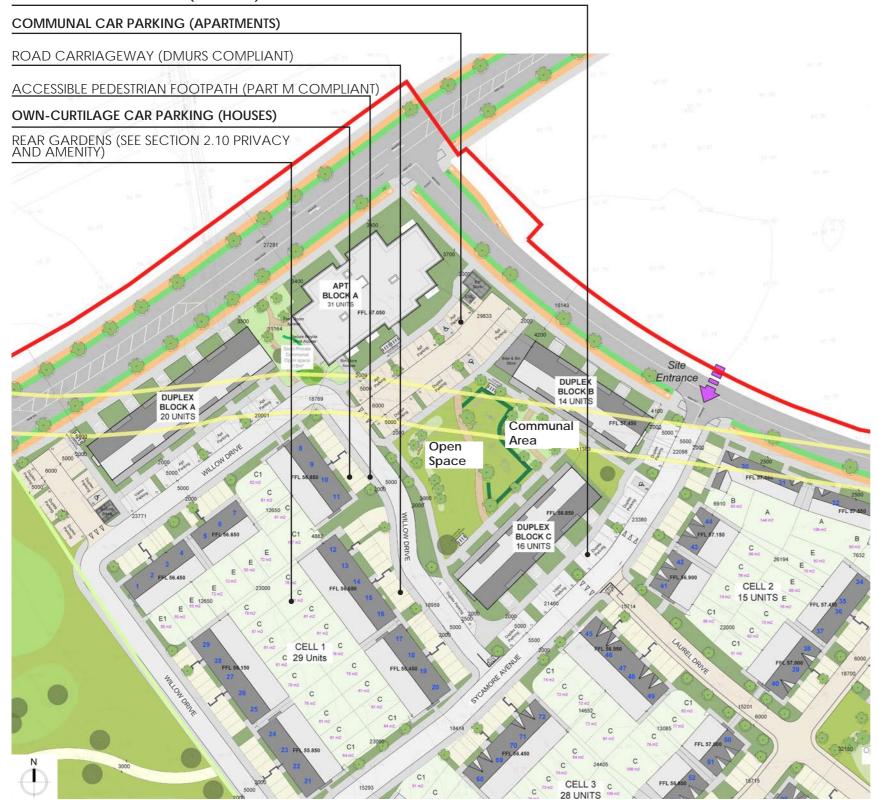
Detail of parking provision integrated in the proposed overall urban design strategy, featuring own curtilage of houses and communal areas adjacent to duplexes and apartments, including accessible spaces. Source: MCORM, 2022.
